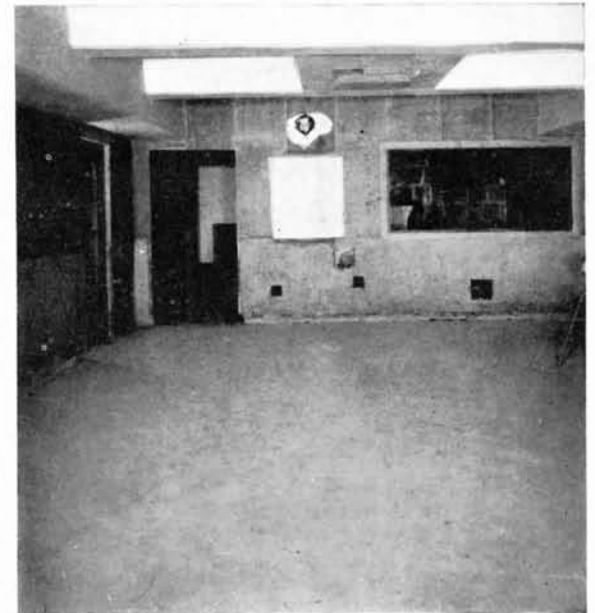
Wire mesh laid over black building paper, ready for concrete floor.
